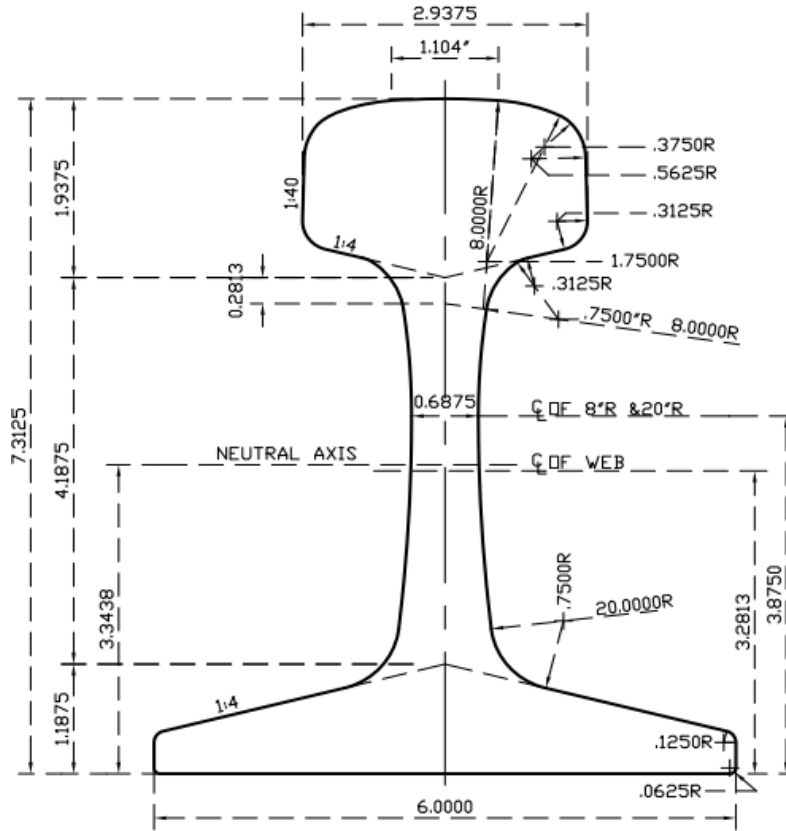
The 136 RE rail section (AREMA, 2011)
